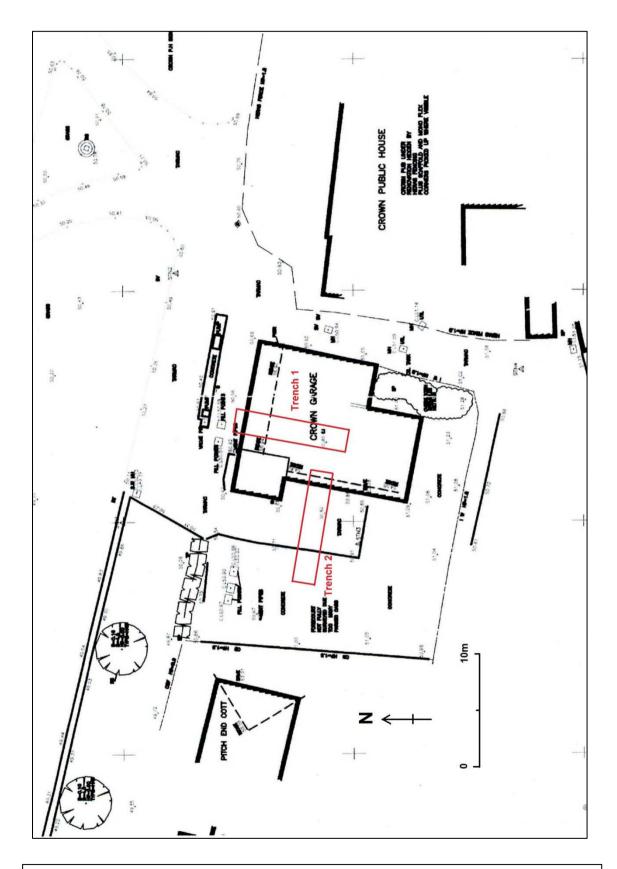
Crown View, Horsted Keynes: Site plan showing location of evaluation trenches
